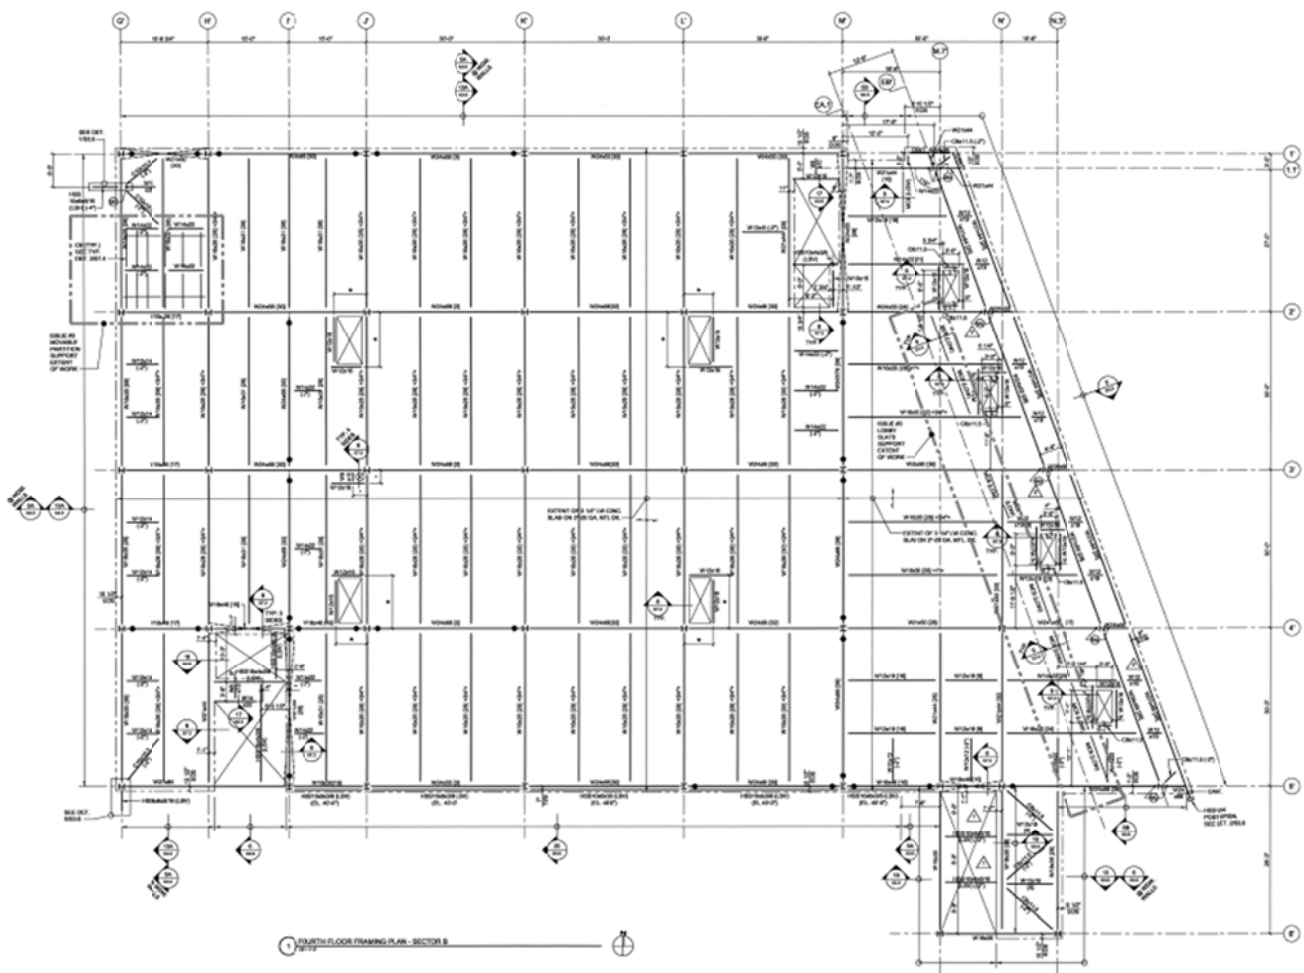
Typical framing layout (Central Tower) Floors two – four (Courtesy of EwingCole)
